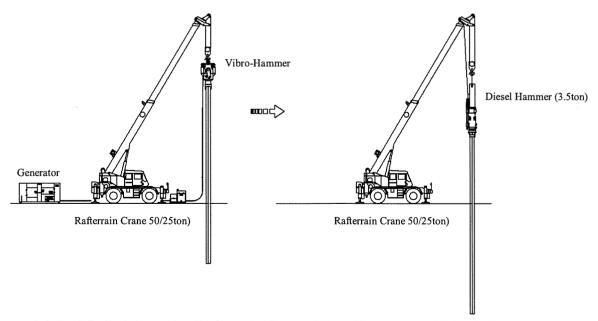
Pile Driving using Rafterrain Crane, Vibro-Hammer and Diesel Hammer
